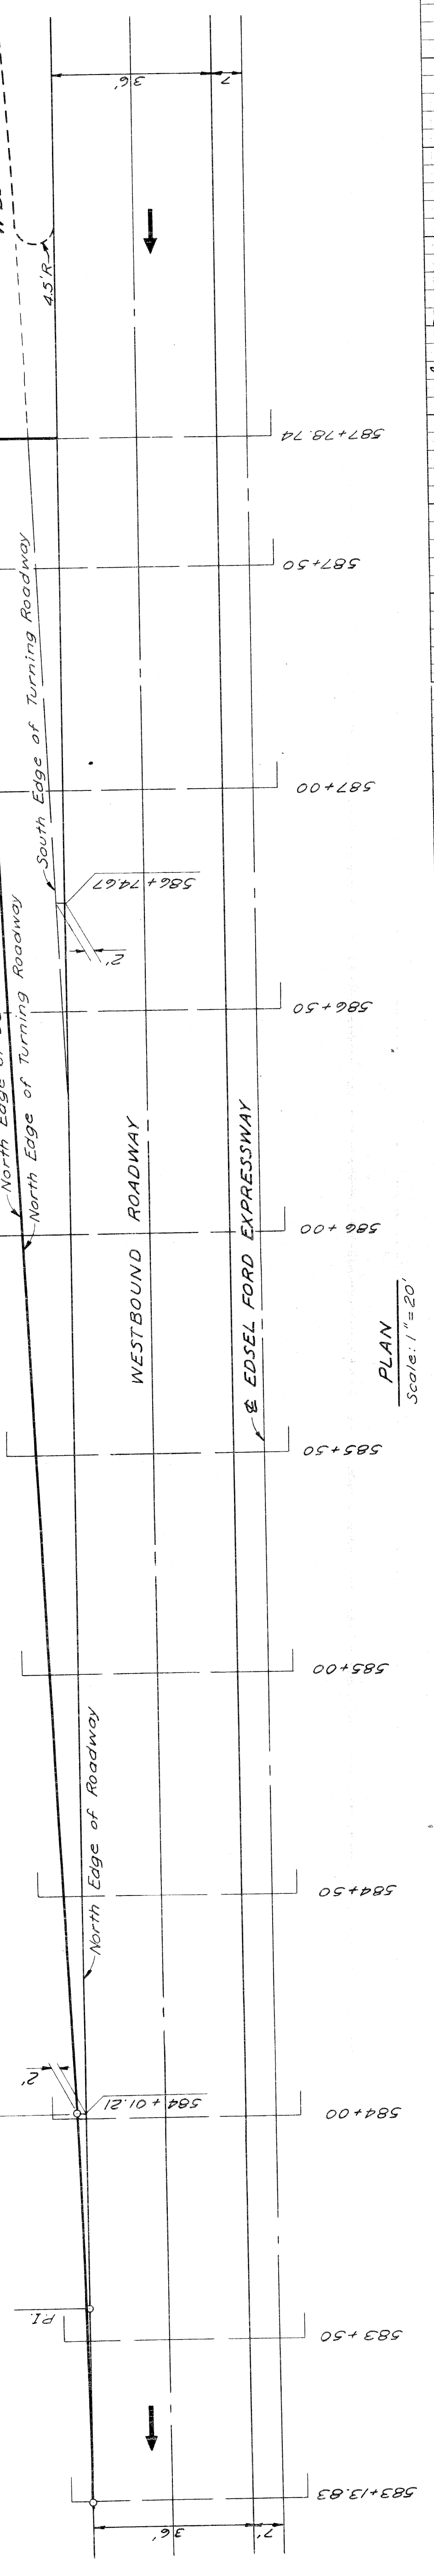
DETAILED GRADES FOR EBD DETOUR ROADWAY
